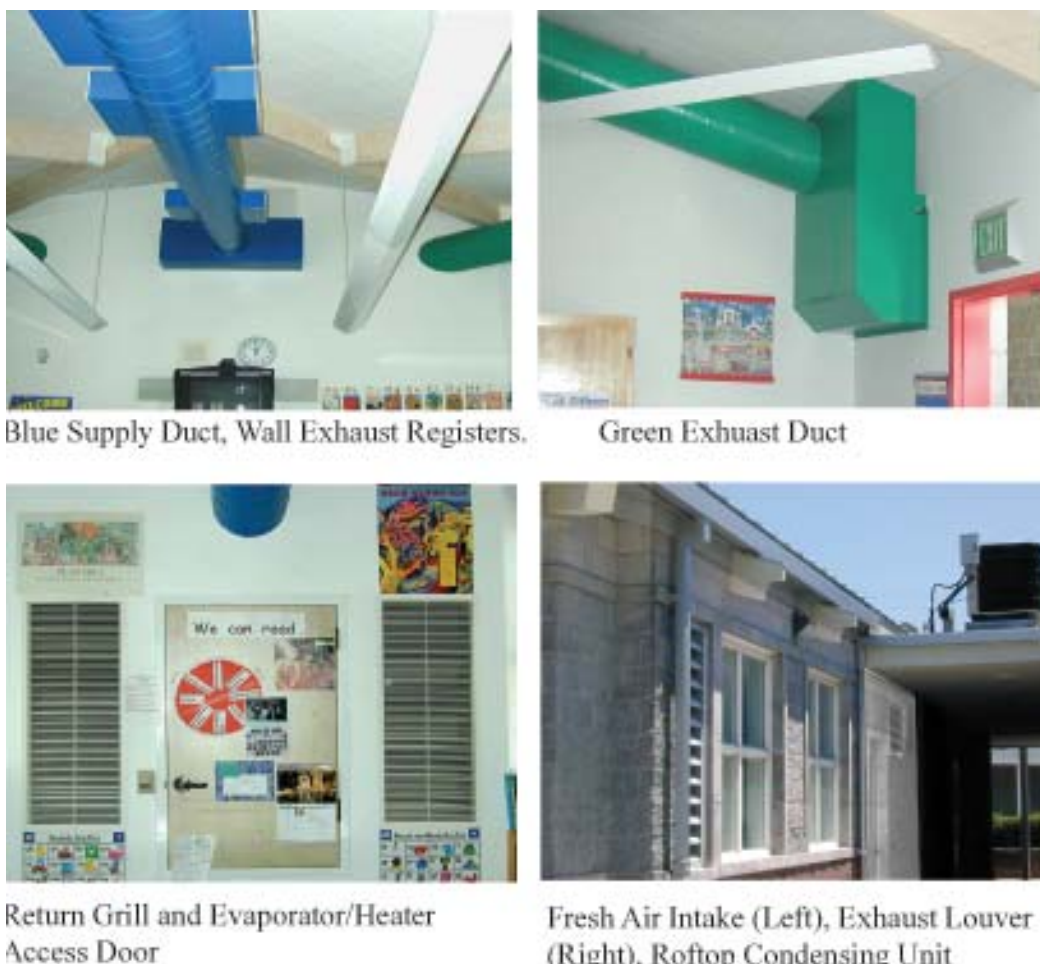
Hanna Ranch Classroom HVAC Equipment Pictures.
